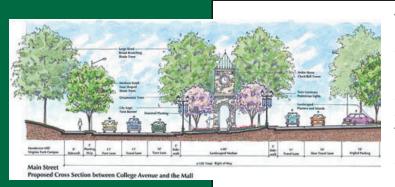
9 Street Boulevard (www.blacksburg.gov)
